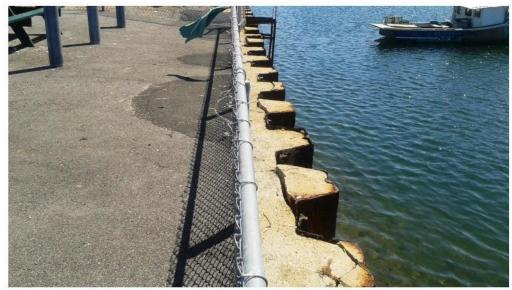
Southern park bulkhead area showing pavement patches and cracking/subsidence of the bulkhead concrete indicating gradual loss of backfill likely through low tide corrosion holes
